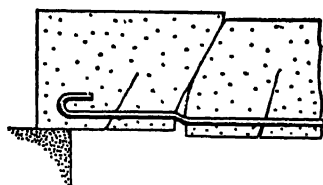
Shear Failure in Concrete Beams.
